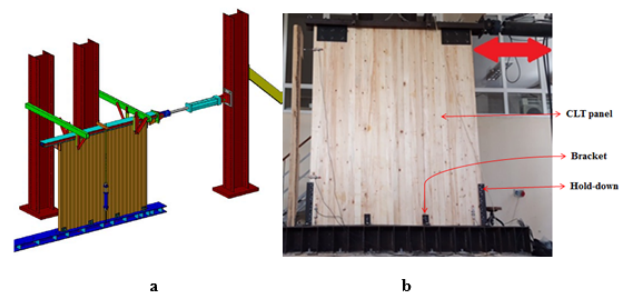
a) Sketch of the test setup used for CLT walls b) CLT wall during test.
